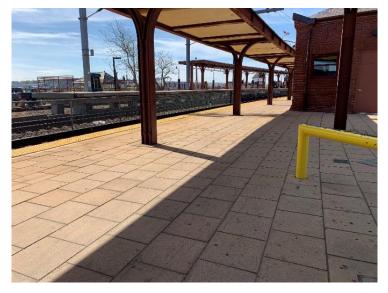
MP 122.90 – Platforms - New London Station (Looking Northeast from West Platform)
